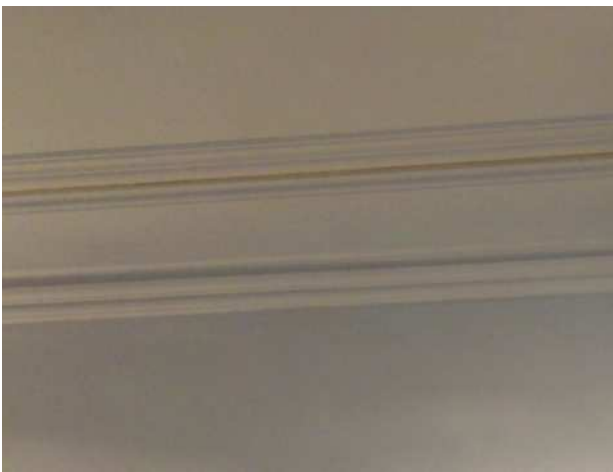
24 Ann Street - INTERIOR – MAIN FLOOR – wood crown moulding
